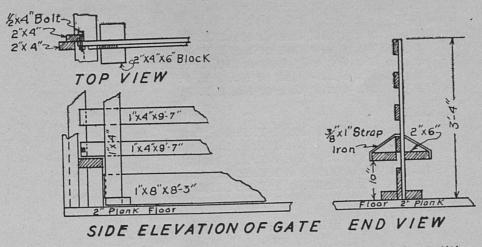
Two Pen Hog House, plan C 6-74-1, details of removable partition.
